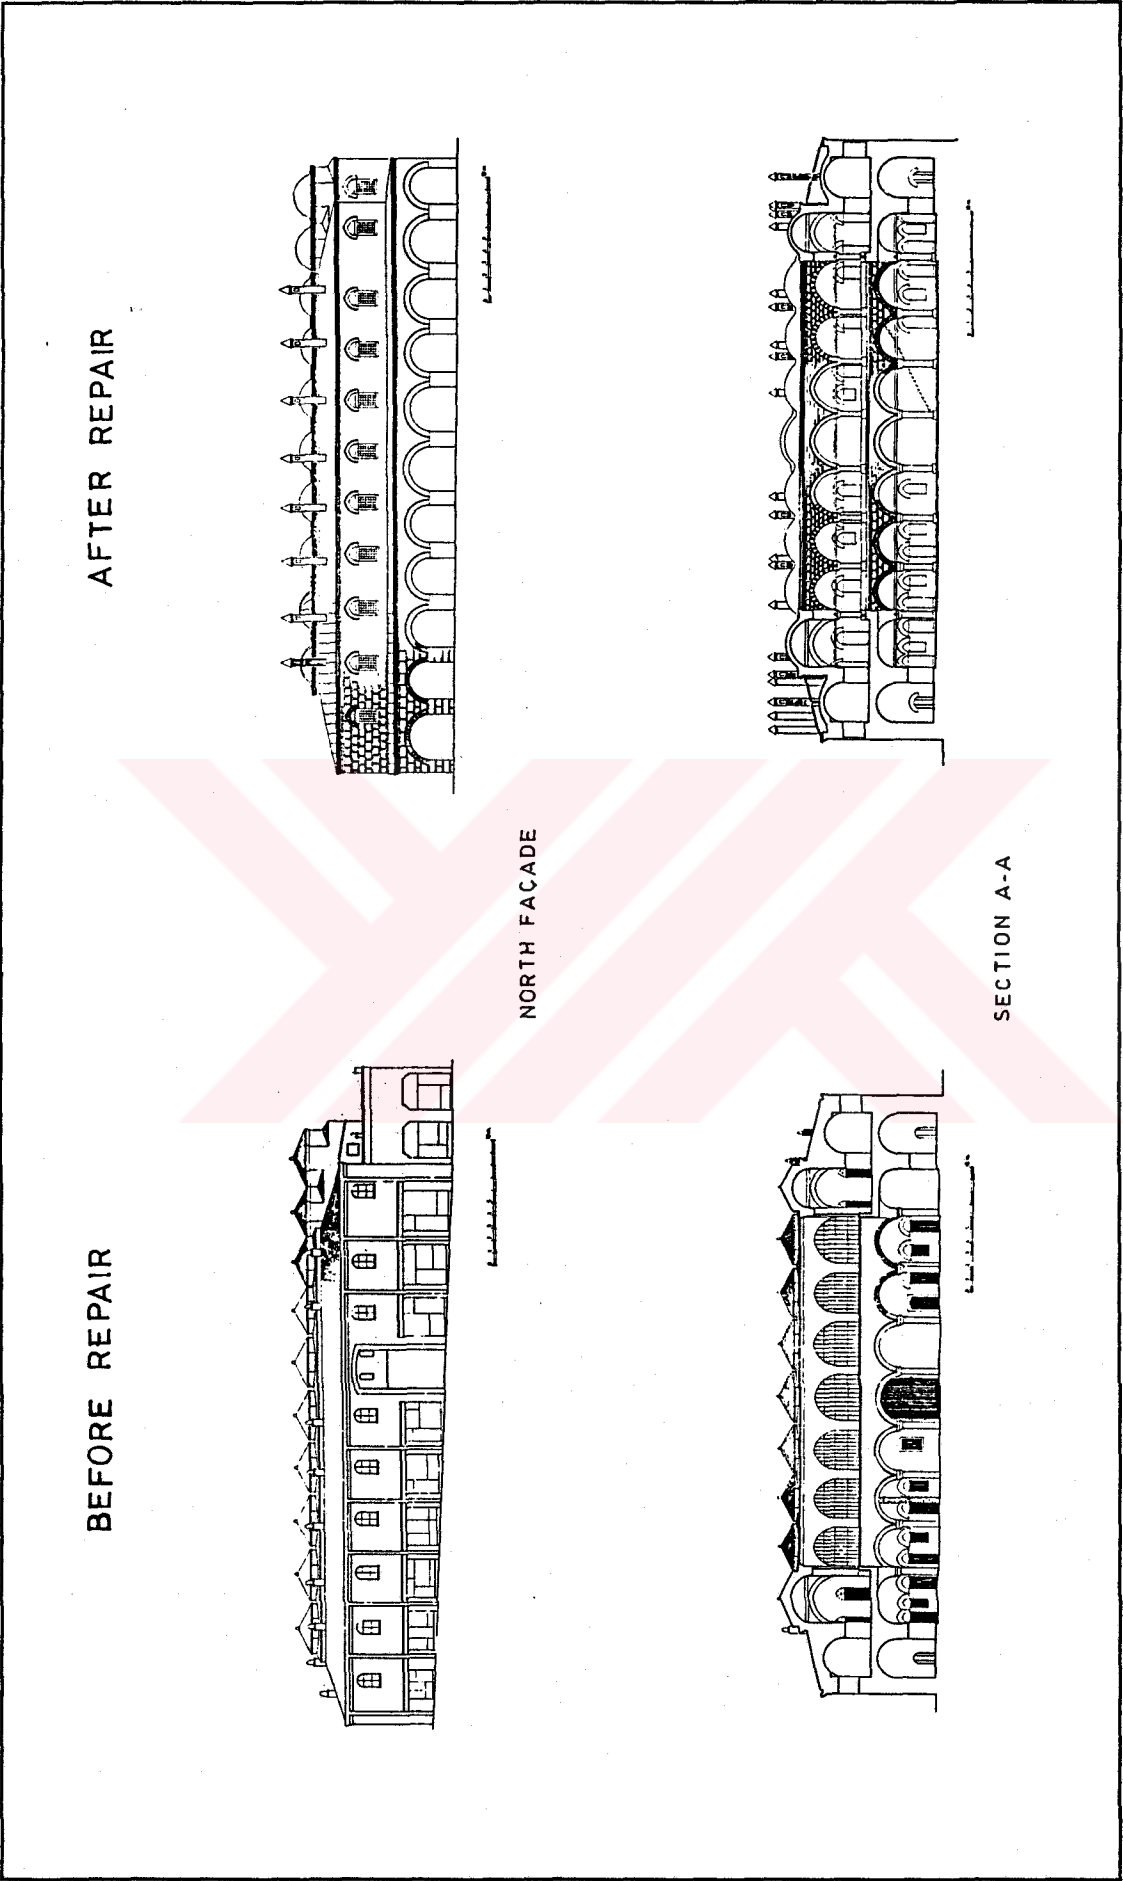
Kurşunlu Khan in Manisa - Façade and Section Drawings
